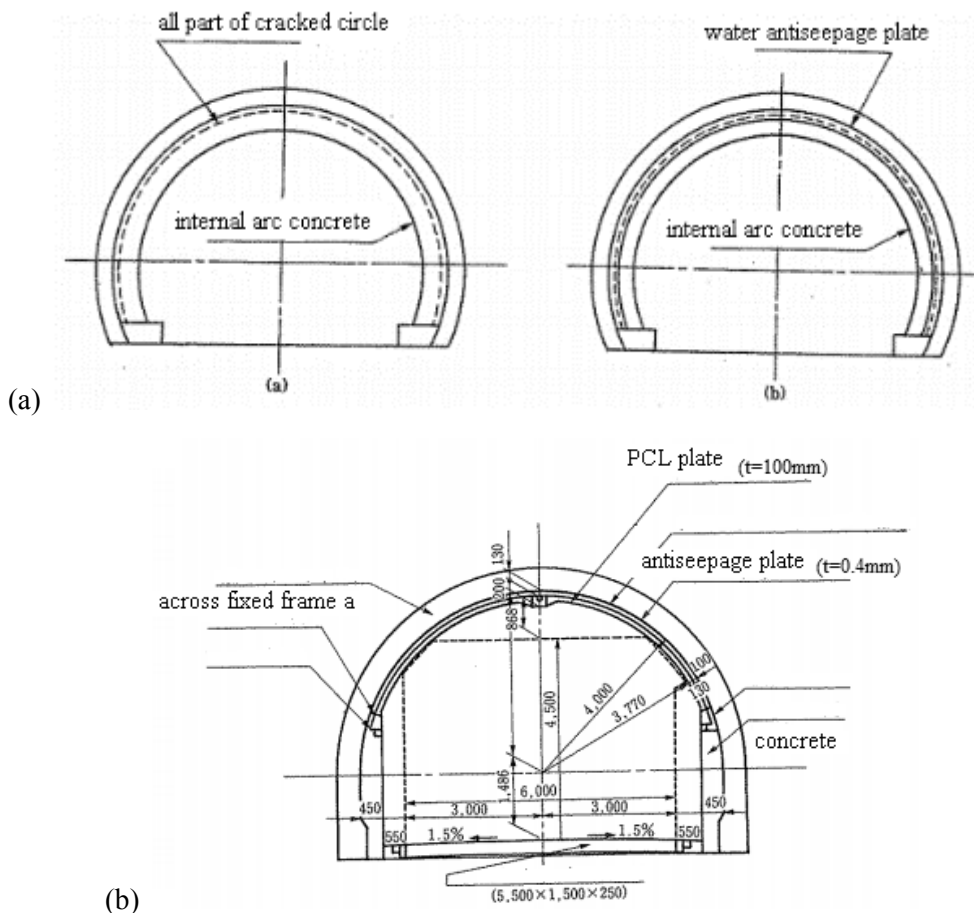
(a) - Construction method of internal arc concrete; (b) - Illustrate PCL construction method (unit:mm)
